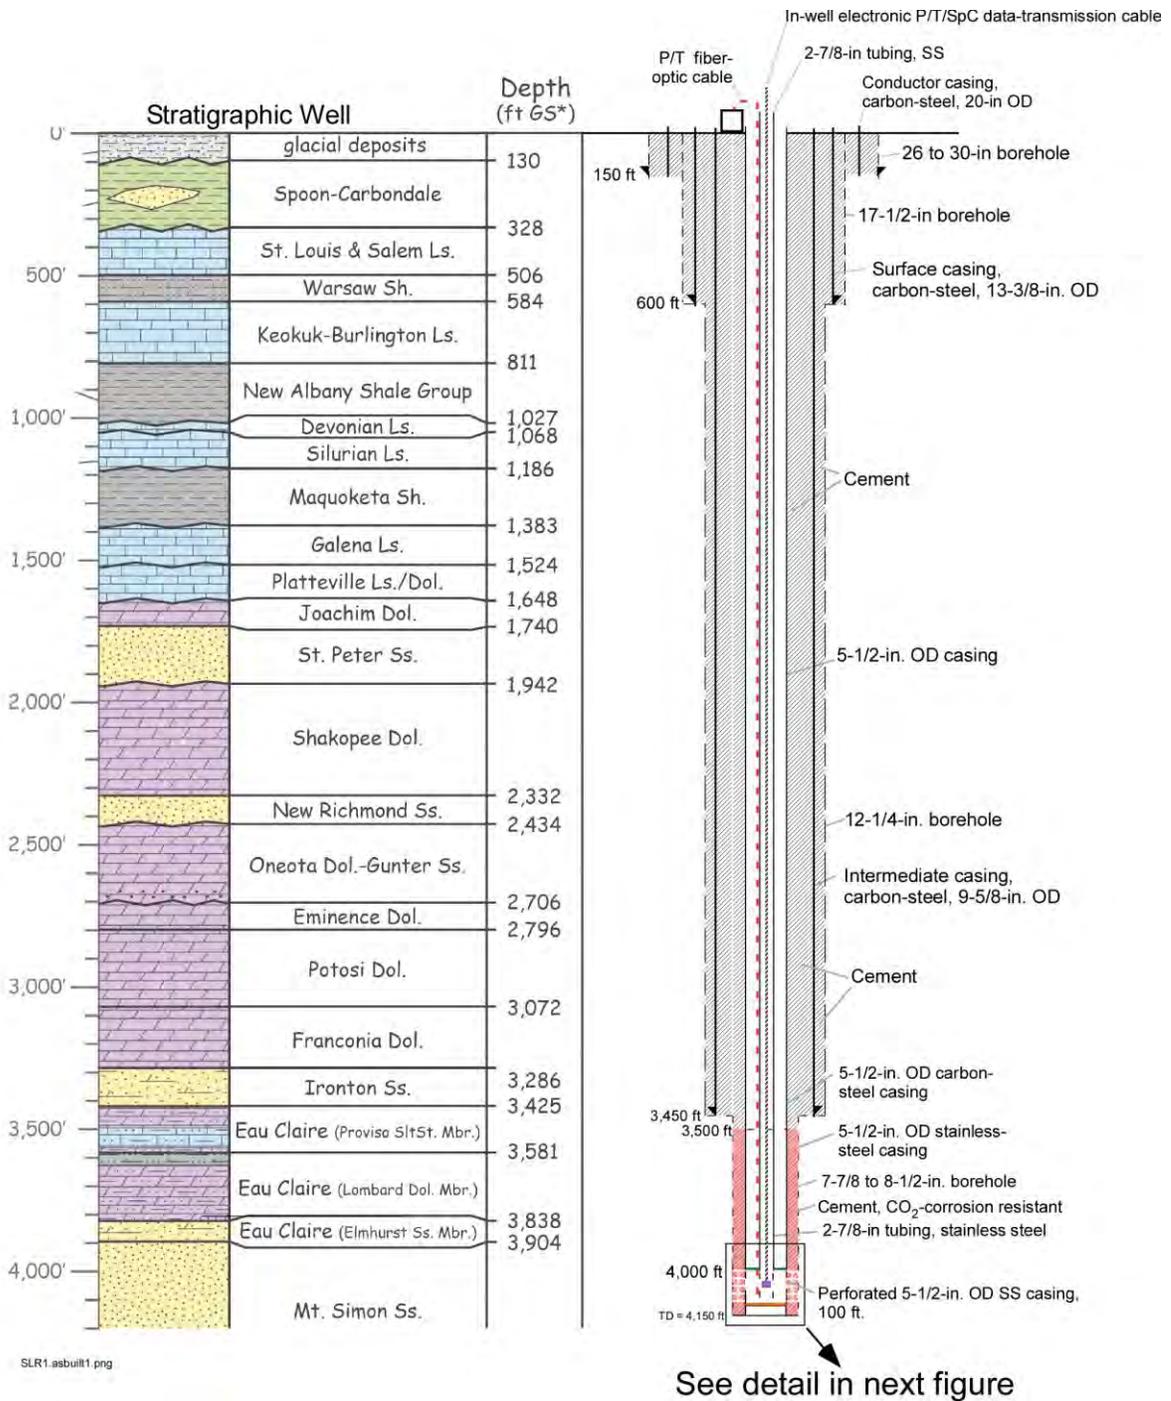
Construction Diagram for the New Single-Level in-Reservoir Monitoring Well (SLR1).
